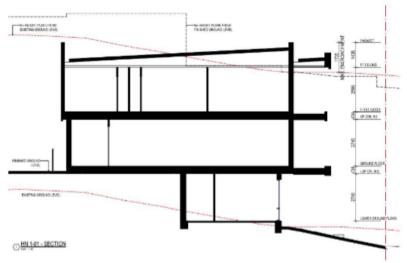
AN EXTRACT OF THE SECTION PLAN FOR LOT 1-01, WHICH DEMONSTRATES HOW SITE TOPOGRAPHY AND SUBSEQUENT STEPPING OF THE BUILDING PLATFORM AFFECTS COMPLIANCE WITH THE BUILDING HEIGHT DEVELOPMENT STANDARD.
